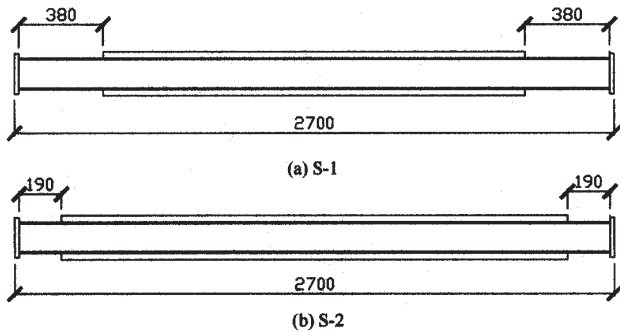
Column specimens with damaged fireproofing (figure courtesy of G.-Q. Li).
